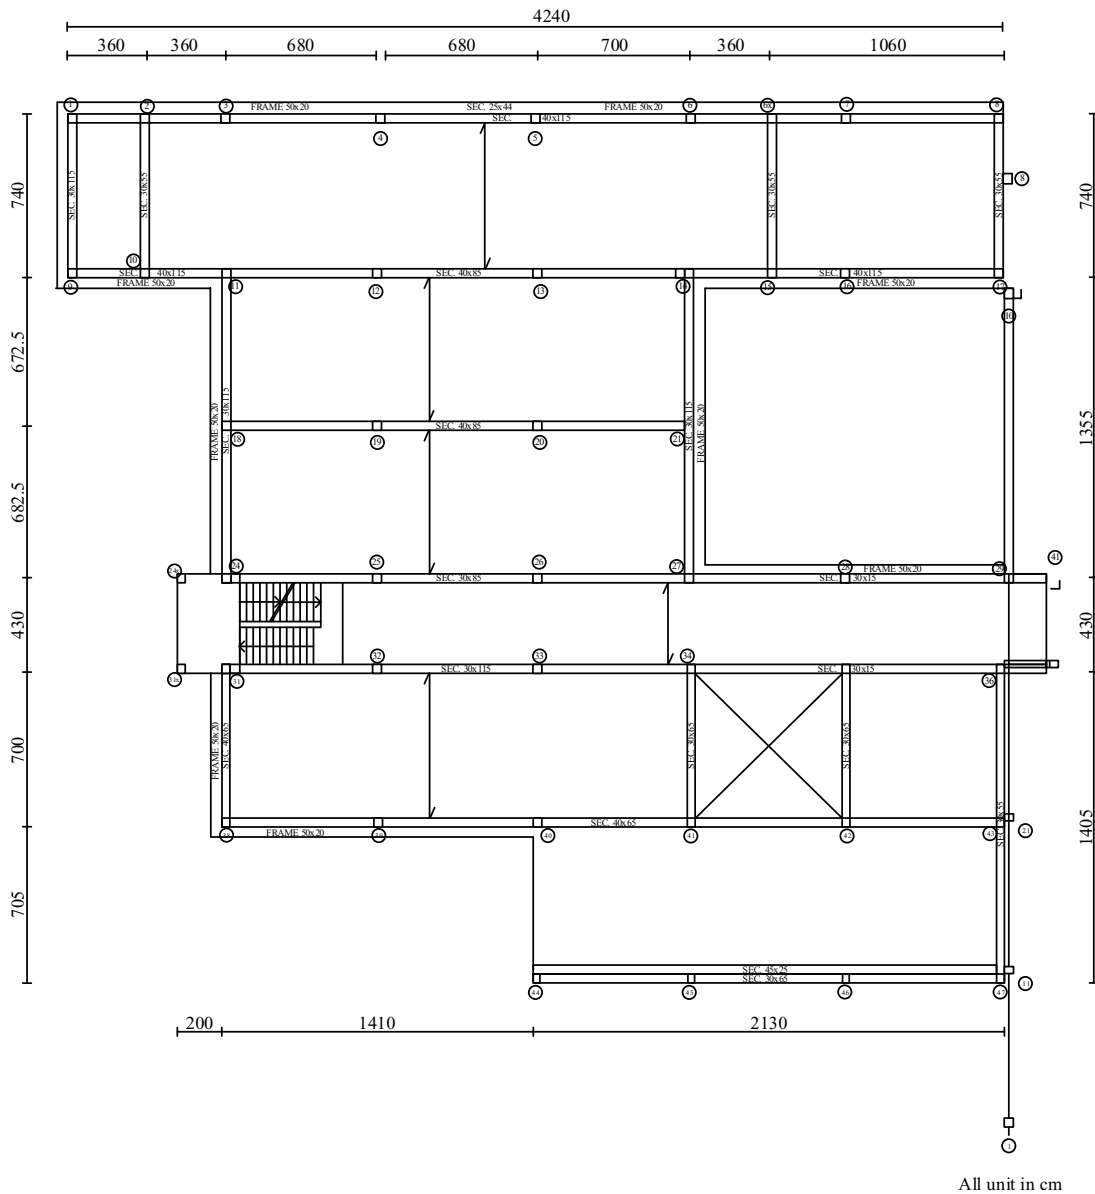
Plan view of the 1st and 2nd floors of the 4-storey building and geometries of the beam and frame sections
